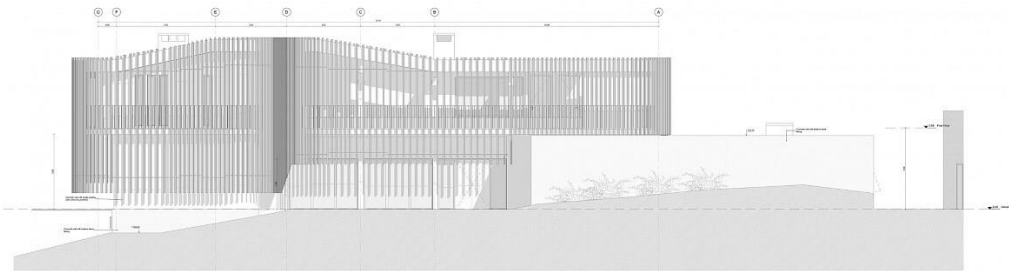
West elevation of the Residence showing sloped roof (Terreneuve, 2022)
